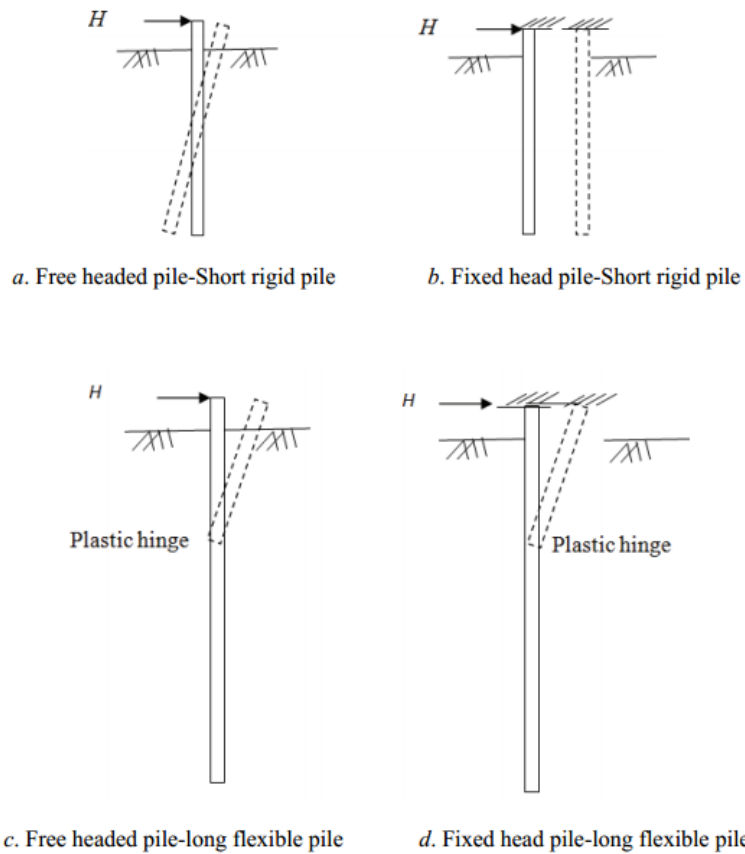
Typical failure modes in short rigid piles and long flexible piles [1]
